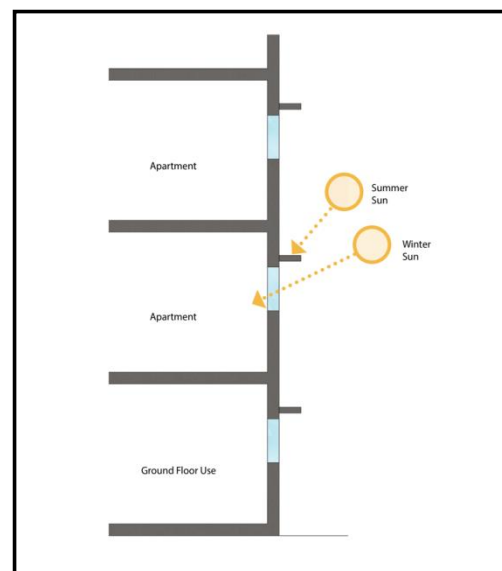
Window shading to apartments facing 30 degrees east or west of north (Image source: NAC SAP)
